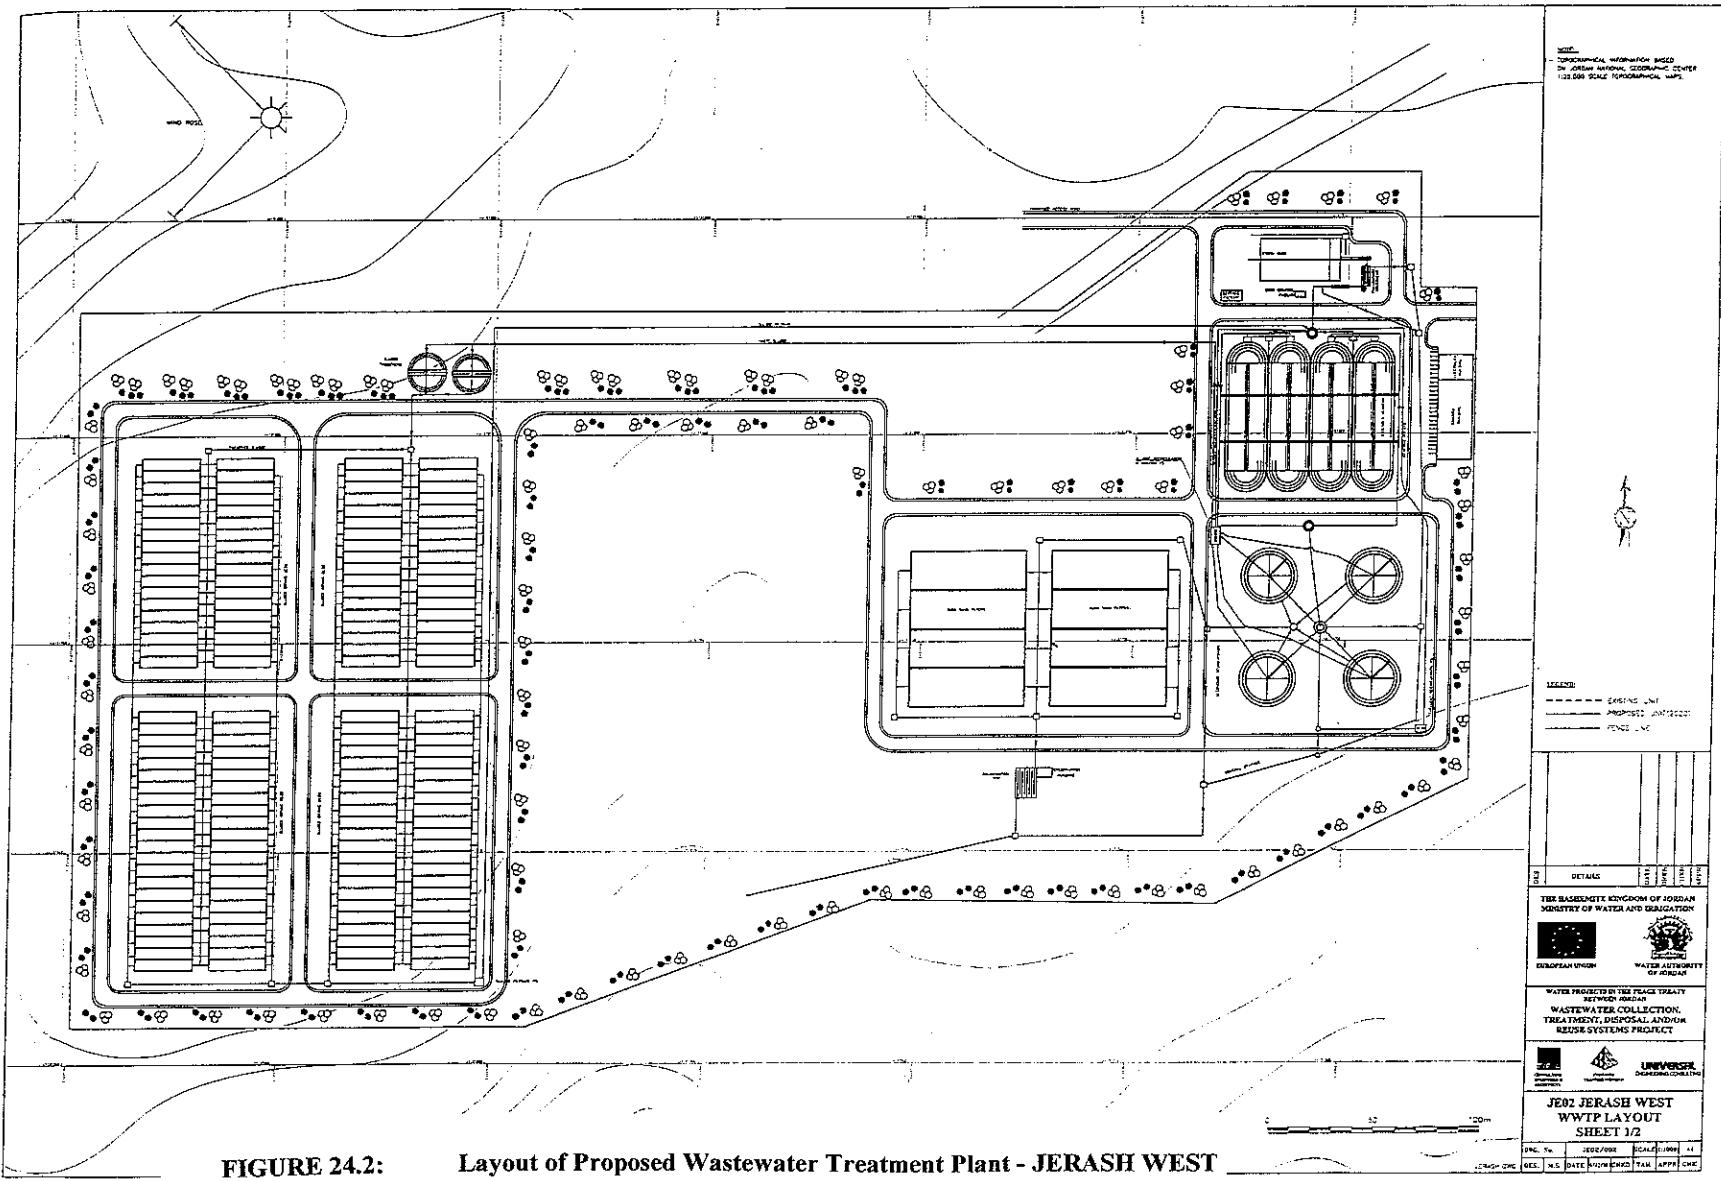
Layout of Proposed Wastewater Treatment Plant - JERASH WEST
